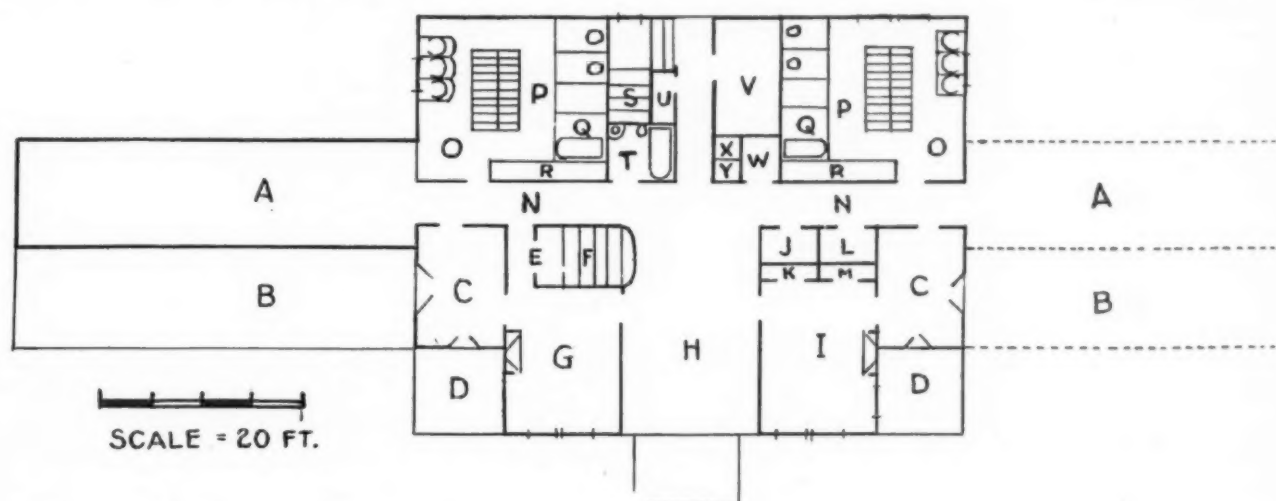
Floor plan of building for the children's department of the Sharon Sanatorium.
